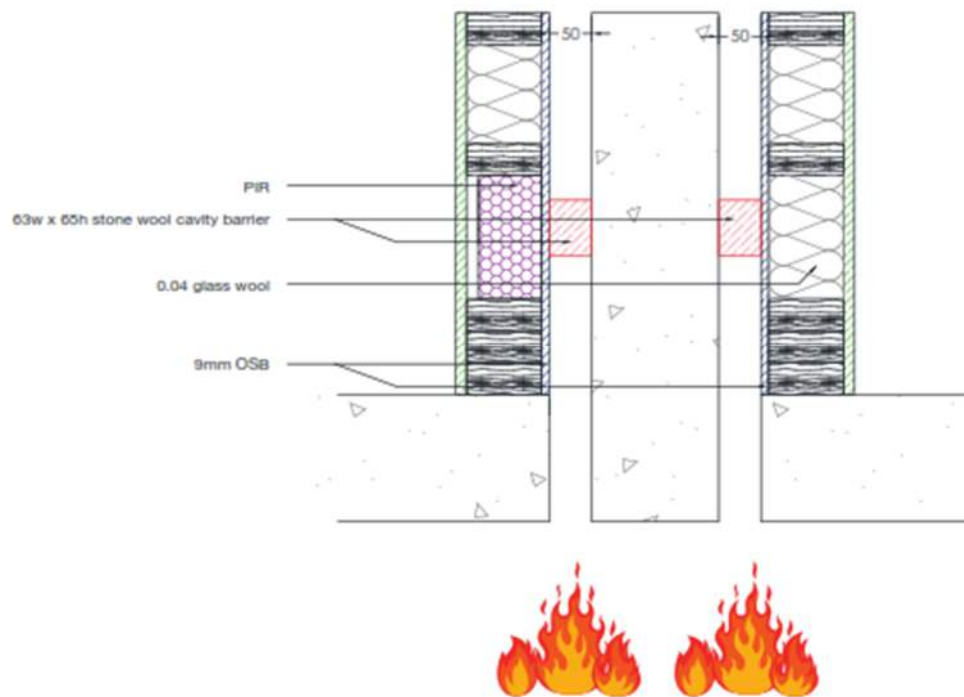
Horizontal fire test for timber batten simulating floor zone condition or window lintel
